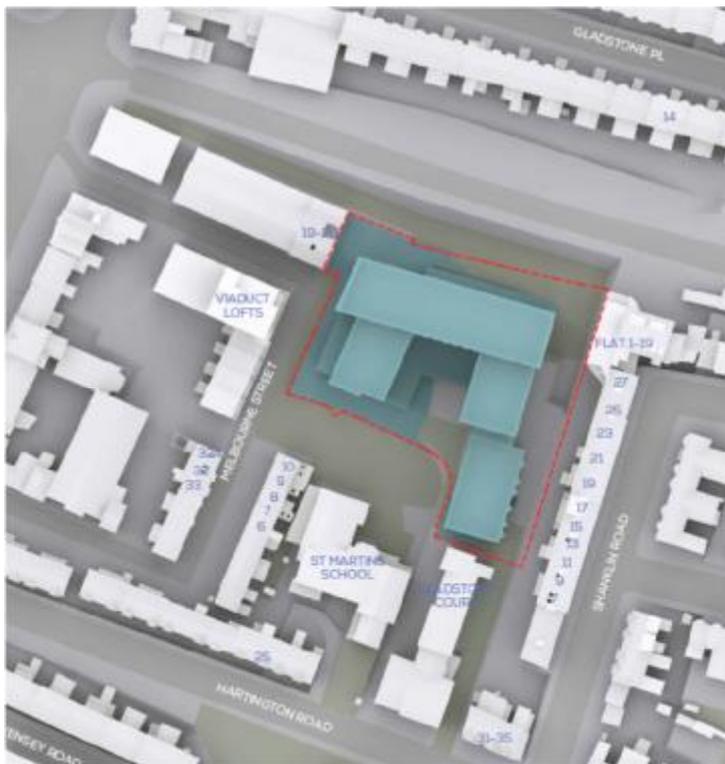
Plan by GIA showing the new development and the nearest surrounding buildings. North is at the top of the plan.
